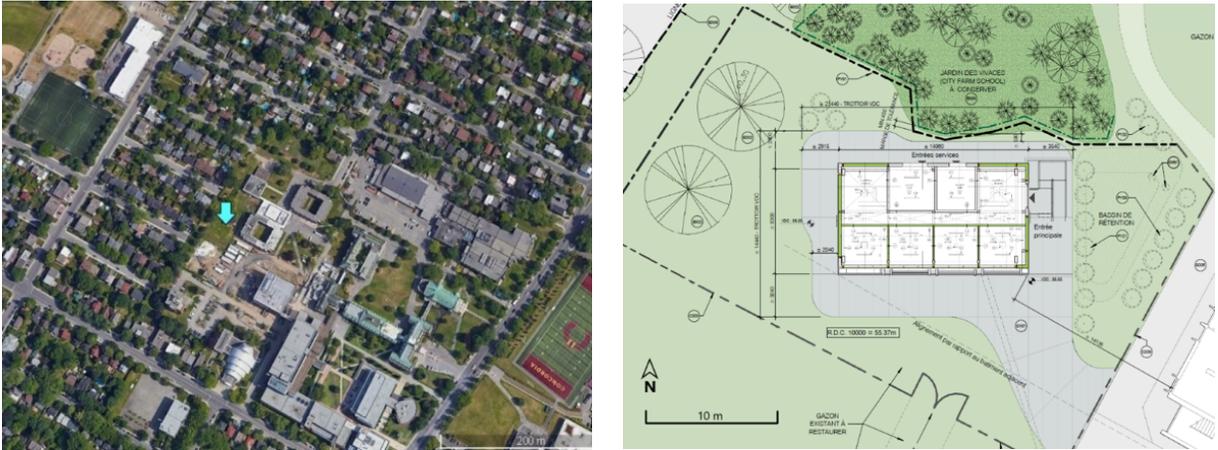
Situation/location plan (left), and landscape boundaries/floor plan (right).
